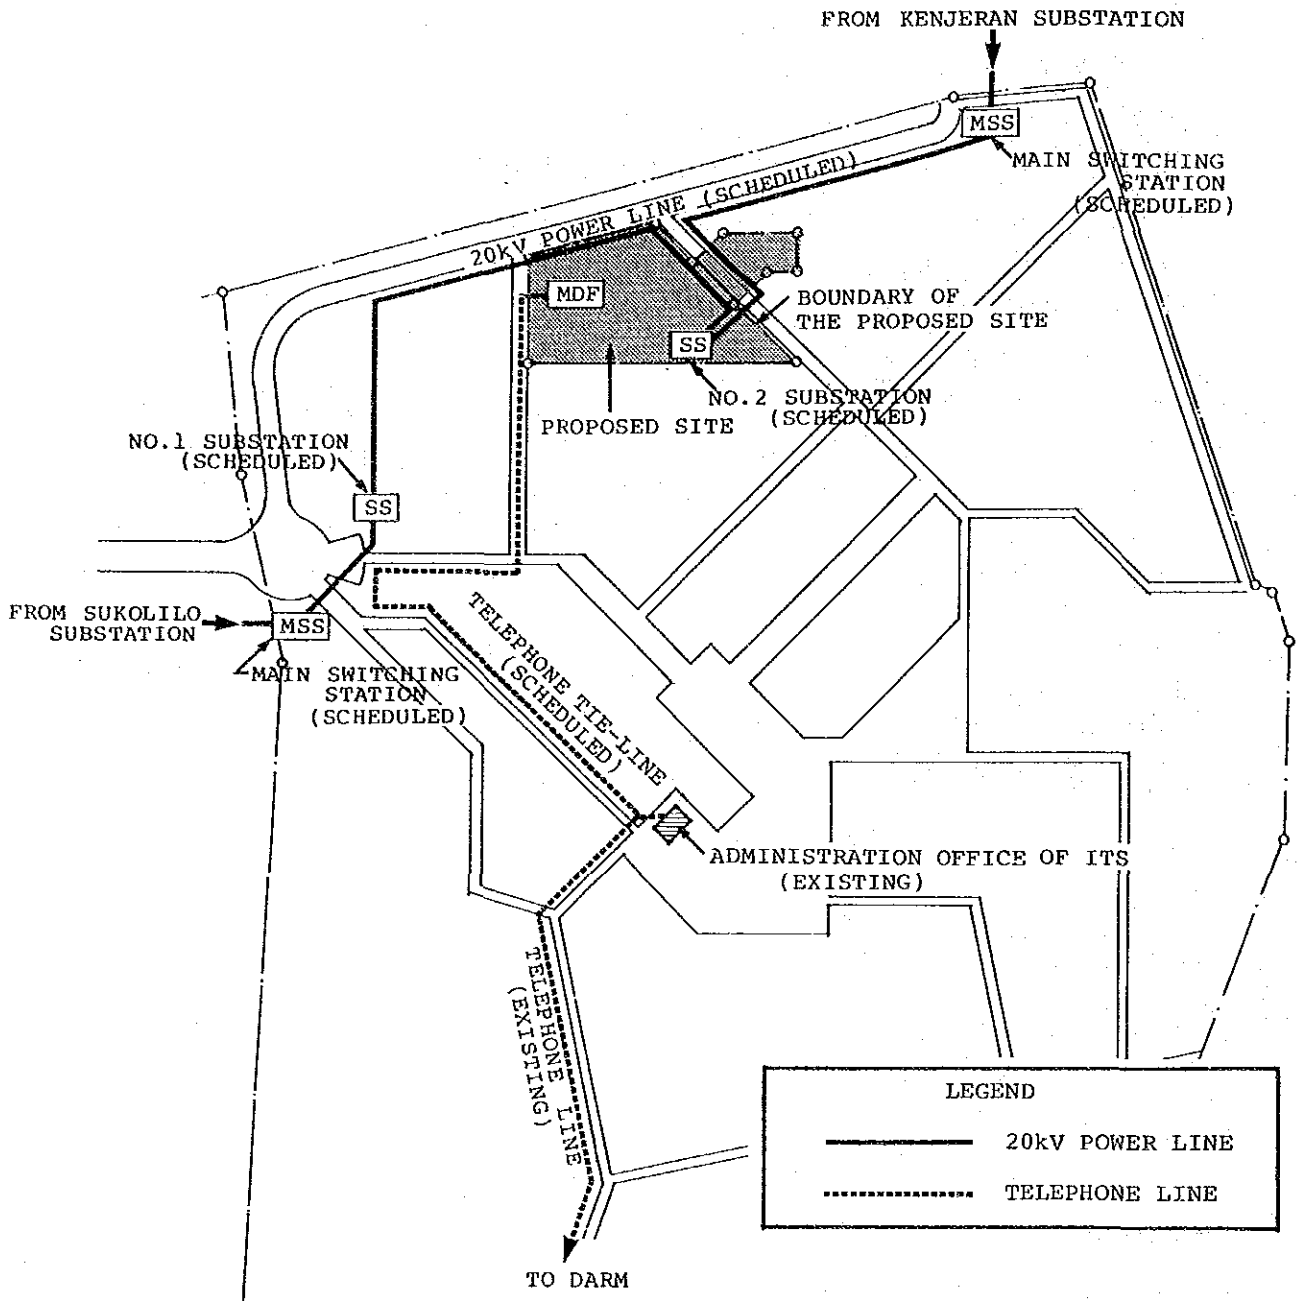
Power and Telephone Line for the Proposed Construction Site
